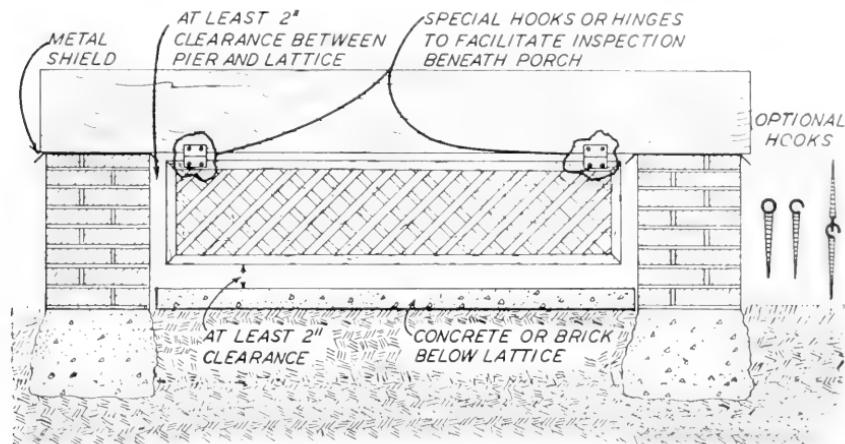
Recommended method of attaching porch lattice, which should hang on hinges to facilitate frequent inspection. Optional hooks shown may be used to allow easy removal of lattice. A clearance of at least 2 inches at sides and bottom is provided to prevent possible entry of termites from soil or piers.
